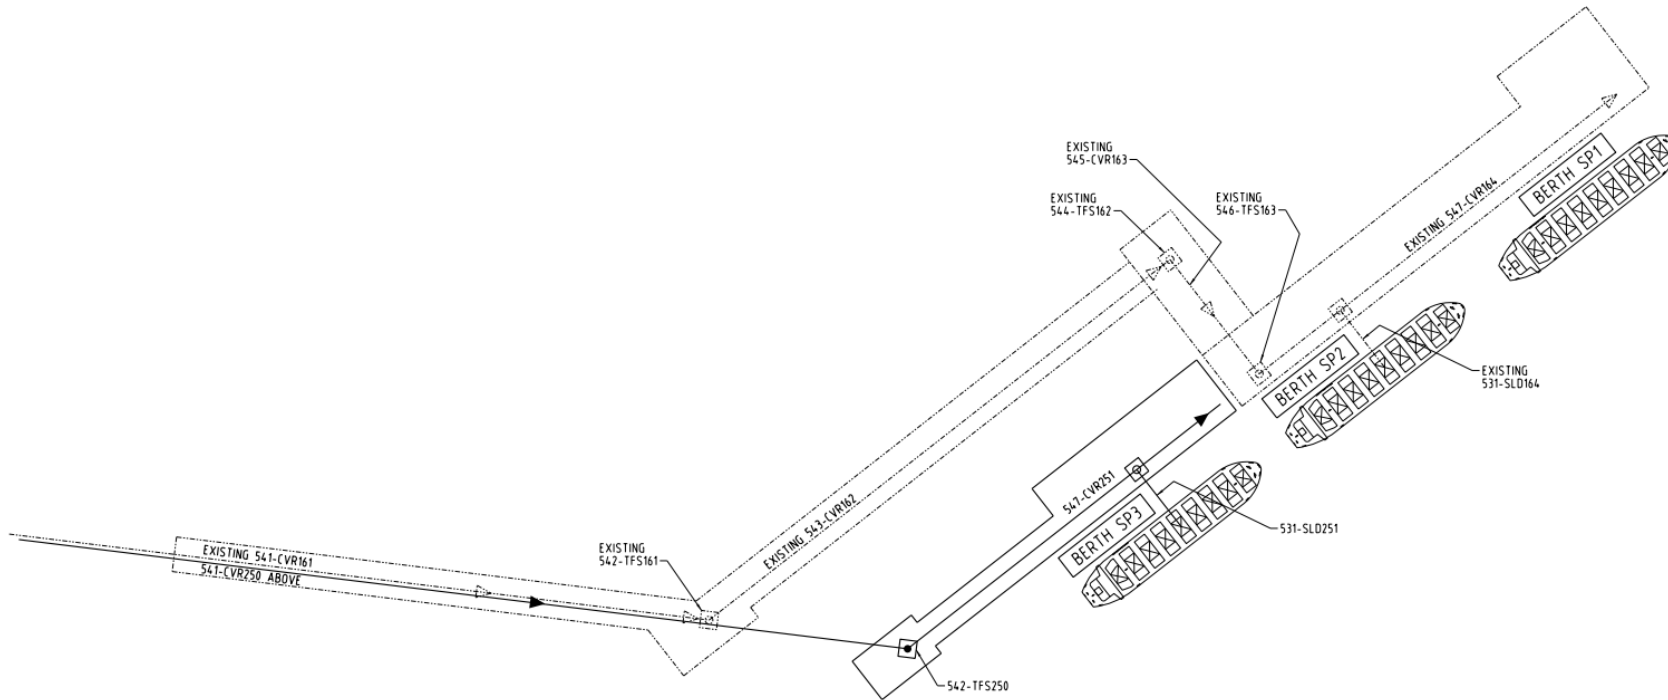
Stockyard Layout (refer to Roy Hill Drawing (4000-ME-DRG-3309))
